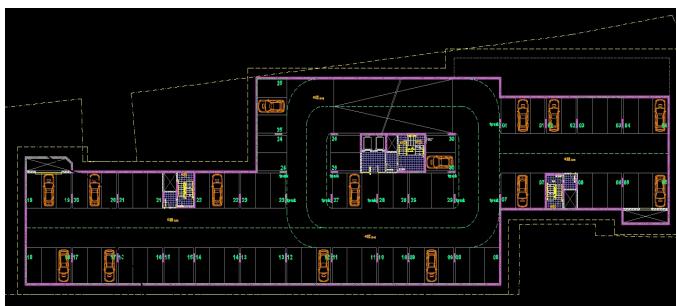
Floor plan of the Iskenderpasa underground parking garage [13]
